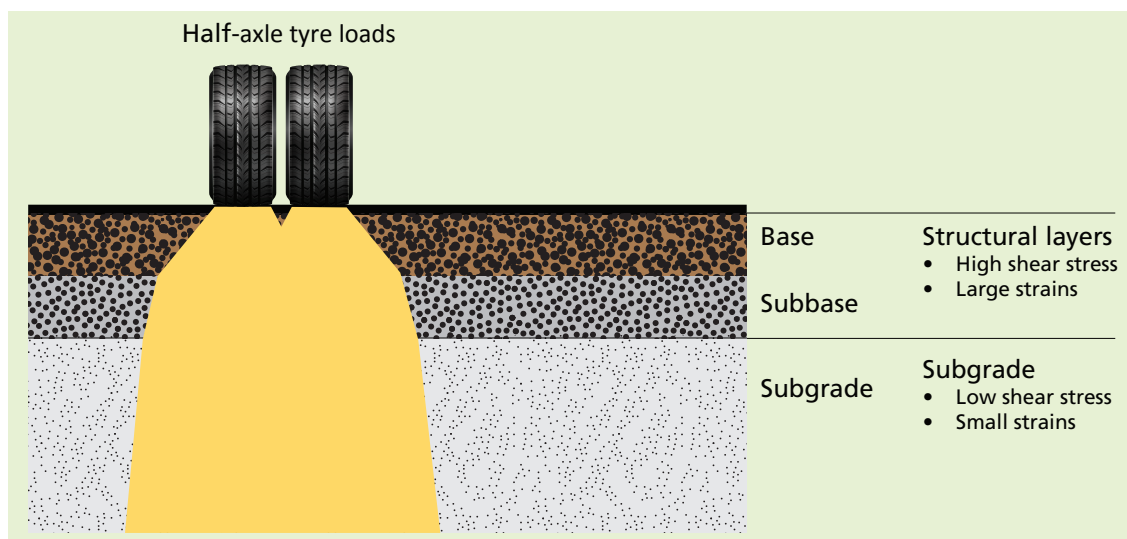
Use of stiff upper pavement layers to distribute stress on subgrade
